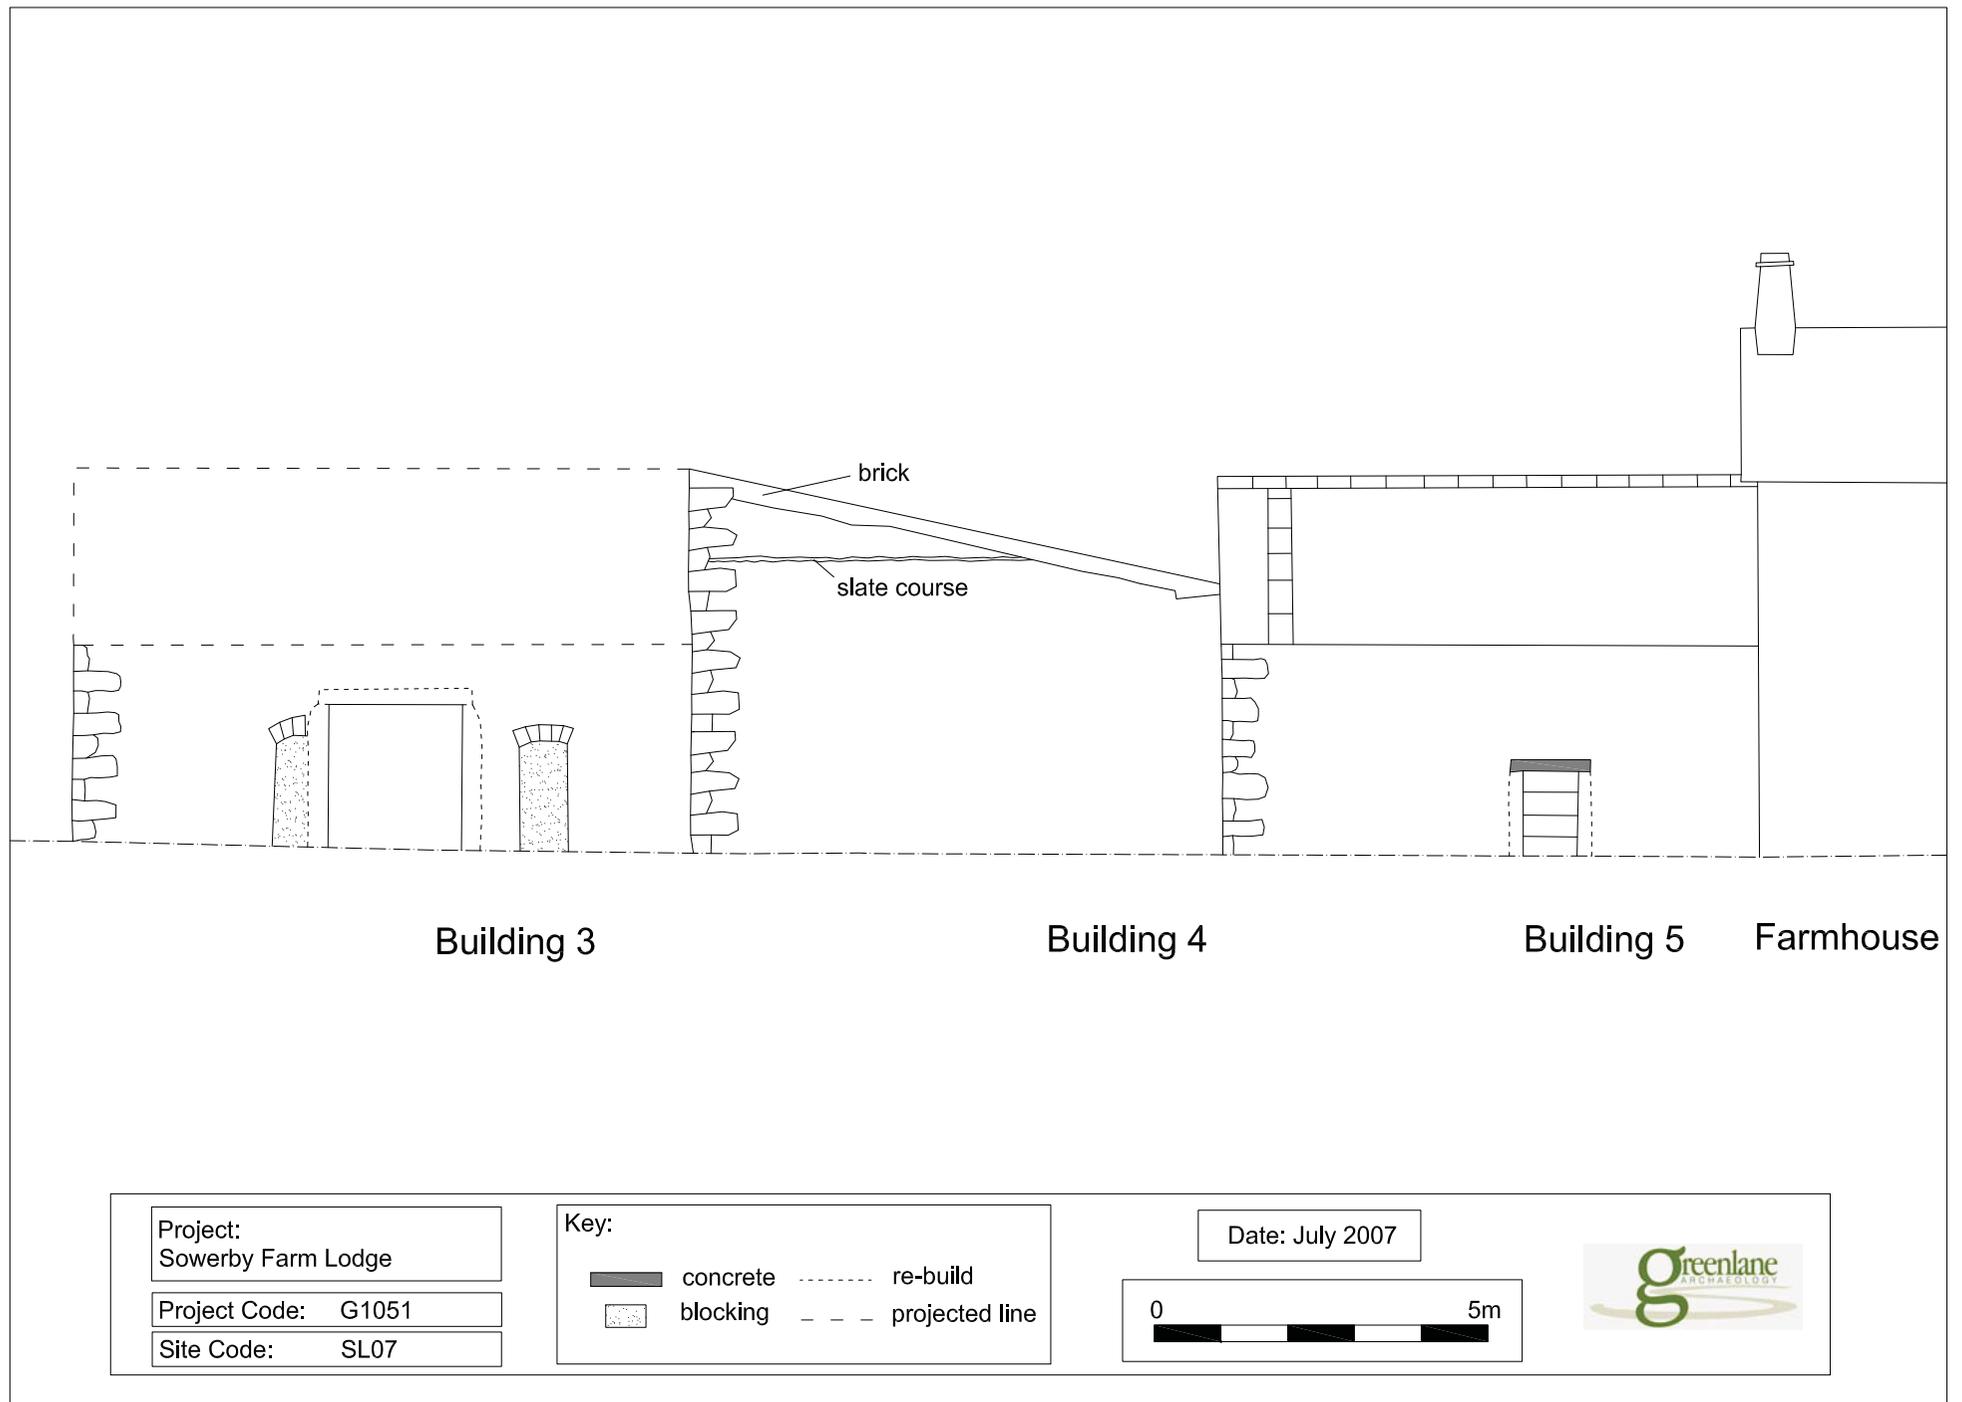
South-south-west elevation of Buildings 3, 4, and 5
